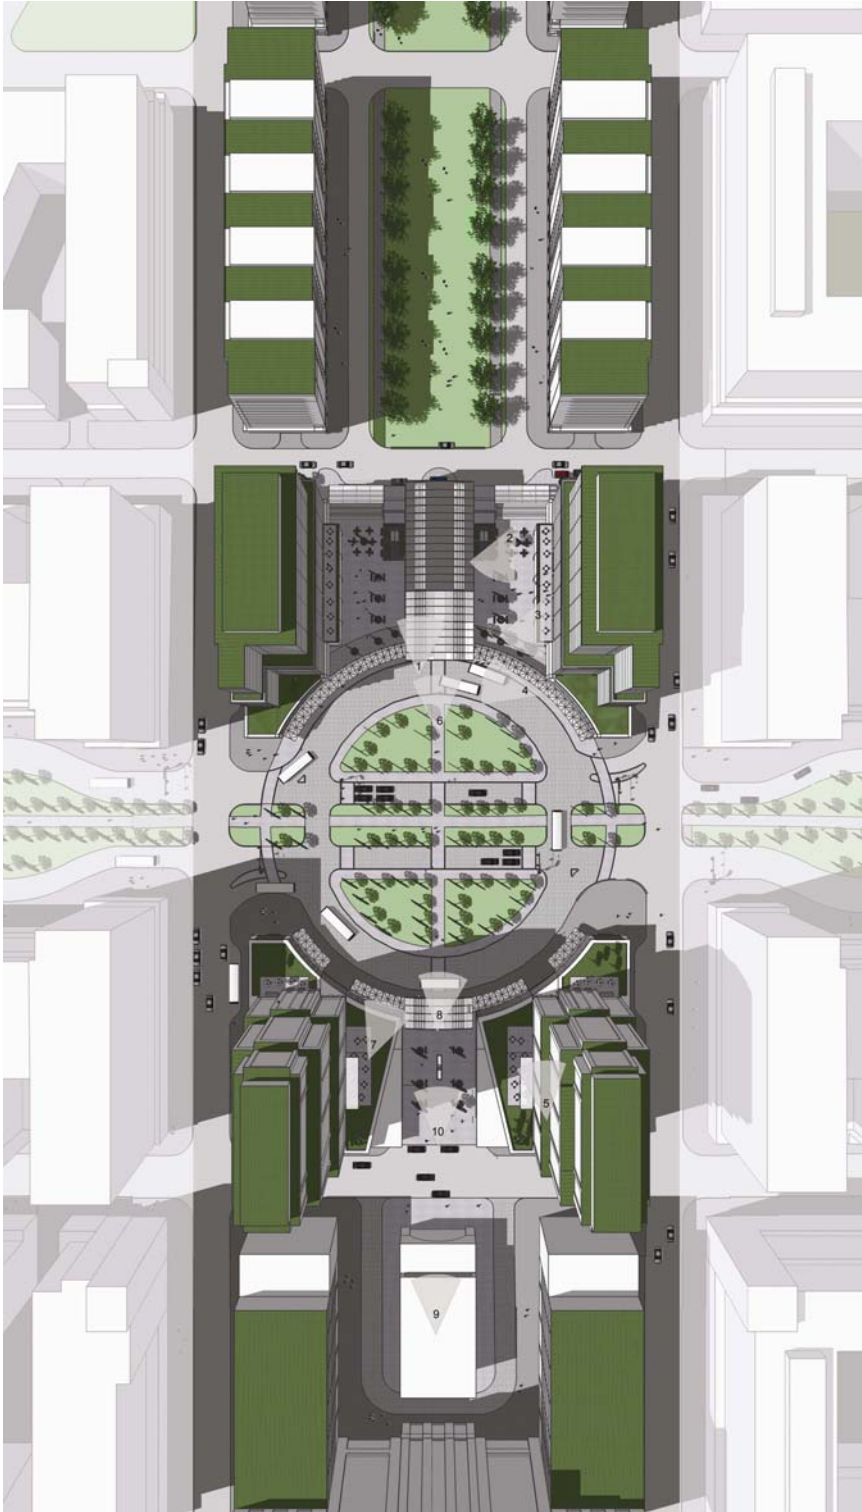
Perspective Plan of Transit Plaza and Adjoining Public Spaces
